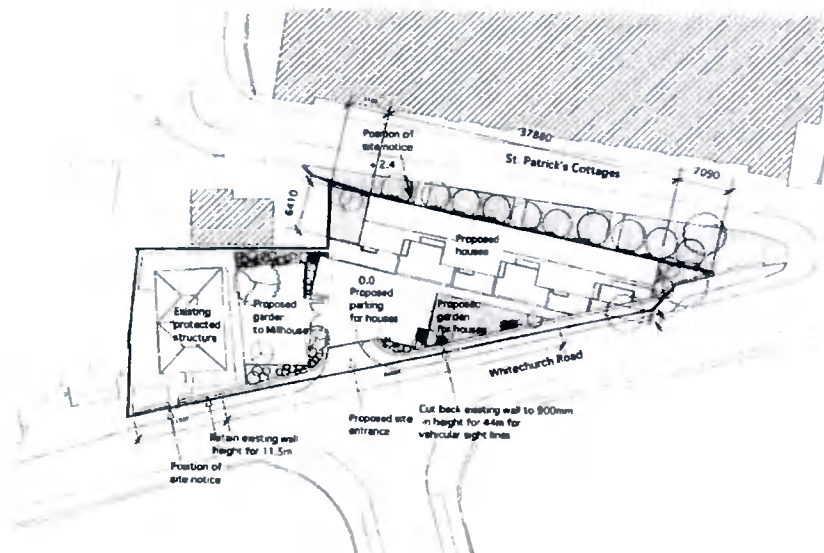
Proposed Site Plan [Source: SDCC's online planning enquiry system]
